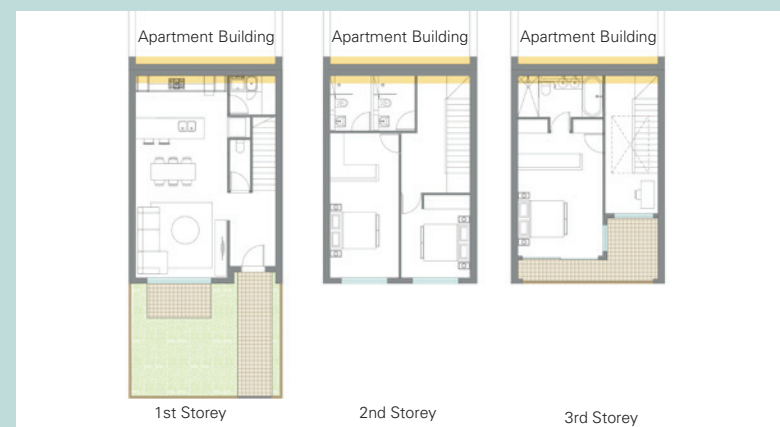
Potential Single Loaded Townhouse Apartment Layout
